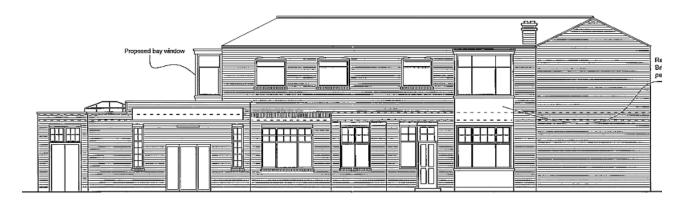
Refused proposed front elevation for planning application 15/01365/FUL.
